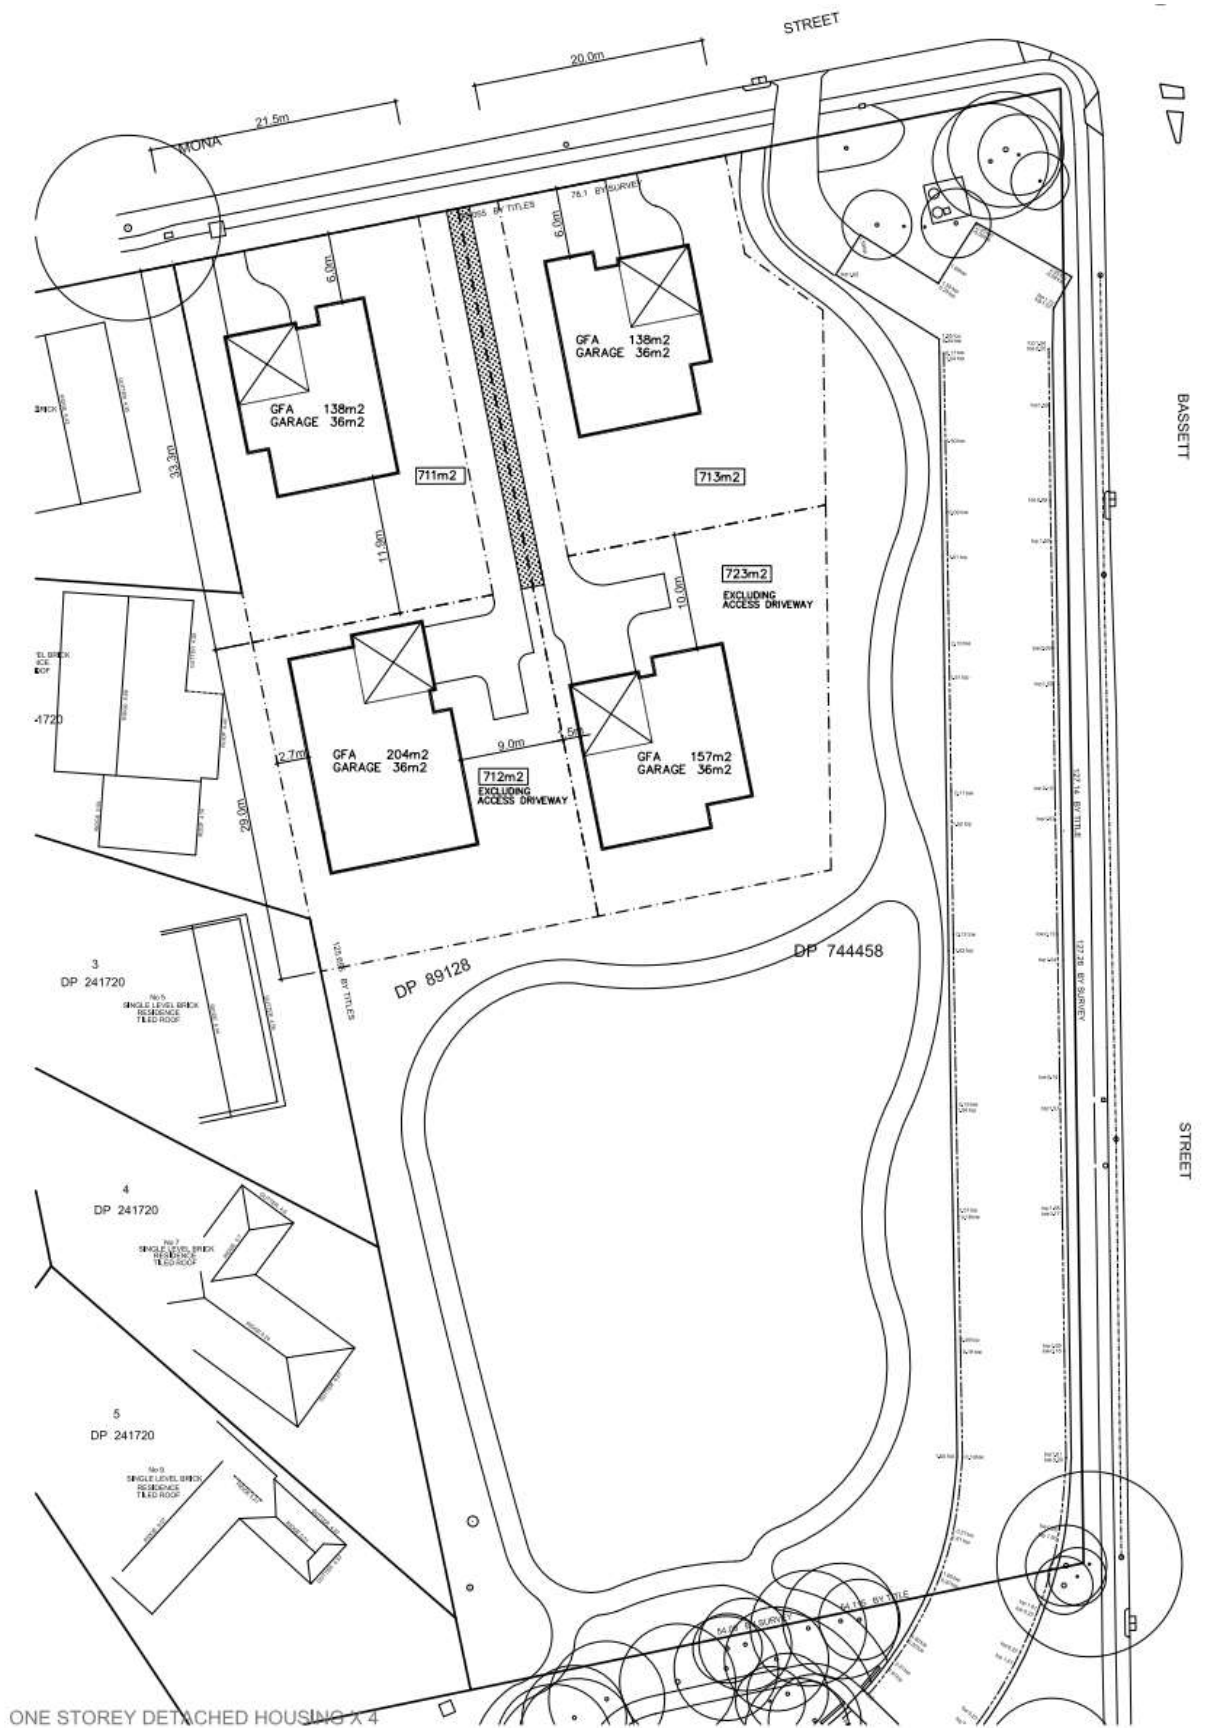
Proposed Subdivision Plan (Source: RJK Architects dated 15/10/20)
